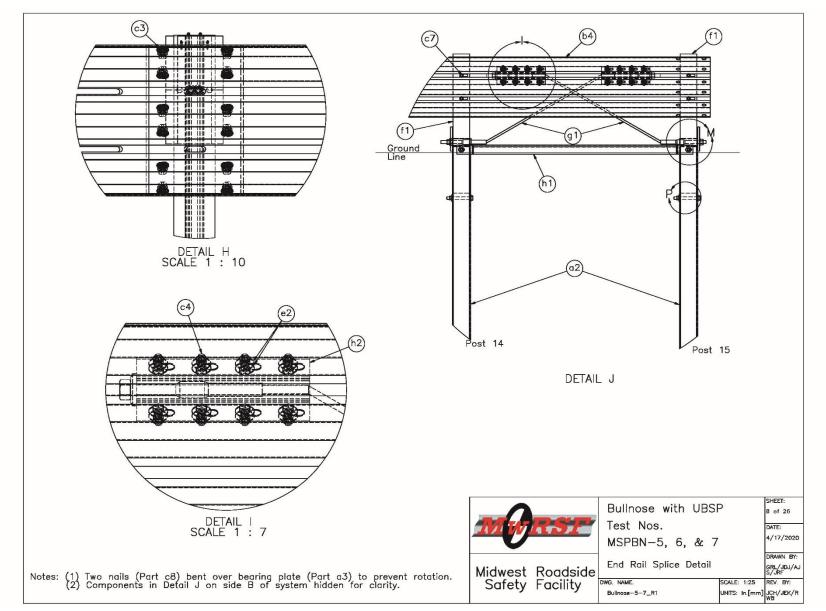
End Rail Splice Detail, Test Nos. MSPBN-5 through MSPBN-7
